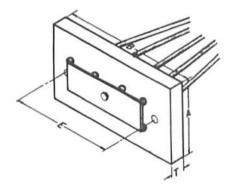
Sample Fixed-End Anchorage Assembly for Unbonded Button-Headed Wire Tendons⁷
